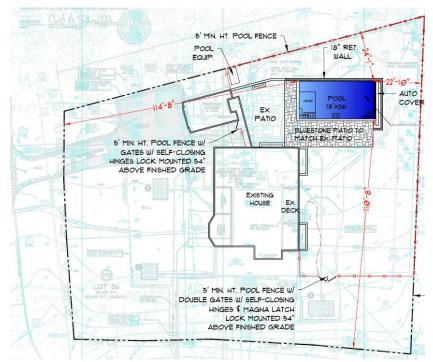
Proposed site plan showing the location of the proposed pool and patio.
